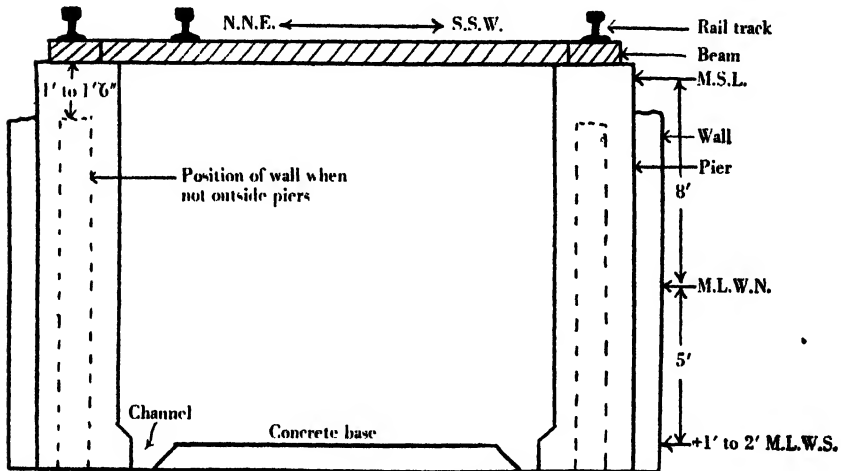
Diagram of section of a typical “box” near E, showing concrete base, channels, piers, walls, beams and rail-track in relation to aspect and tide level.
